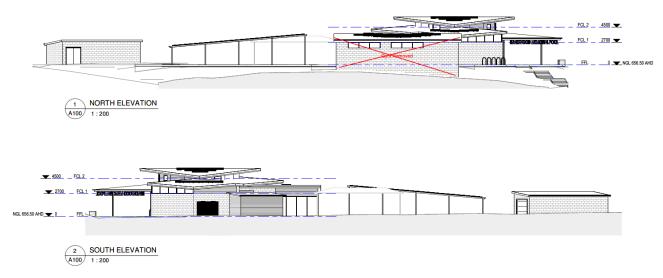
and 4: North and South Elevations (Prepared by Paul Barnett Design Group)
